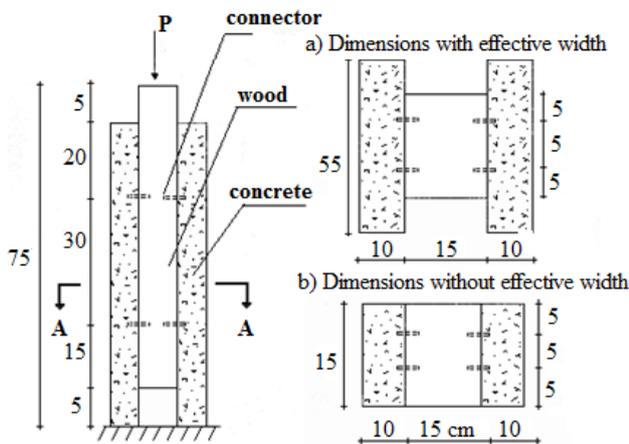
Shear specimen for timber and concrete (units in cm) [15]
